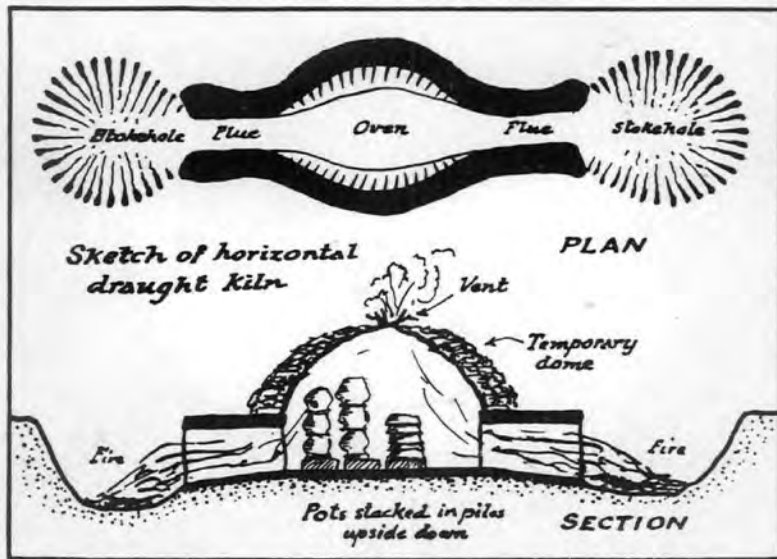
A typical horizontal-draught kiln. Sketch plan and section
